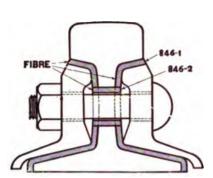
Insulated Rail Joint. Railroad Supply Company.
